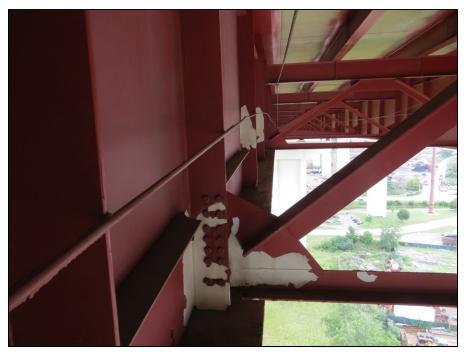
Dirt and deterioration on forward abutment girder A bearing, looking north.
